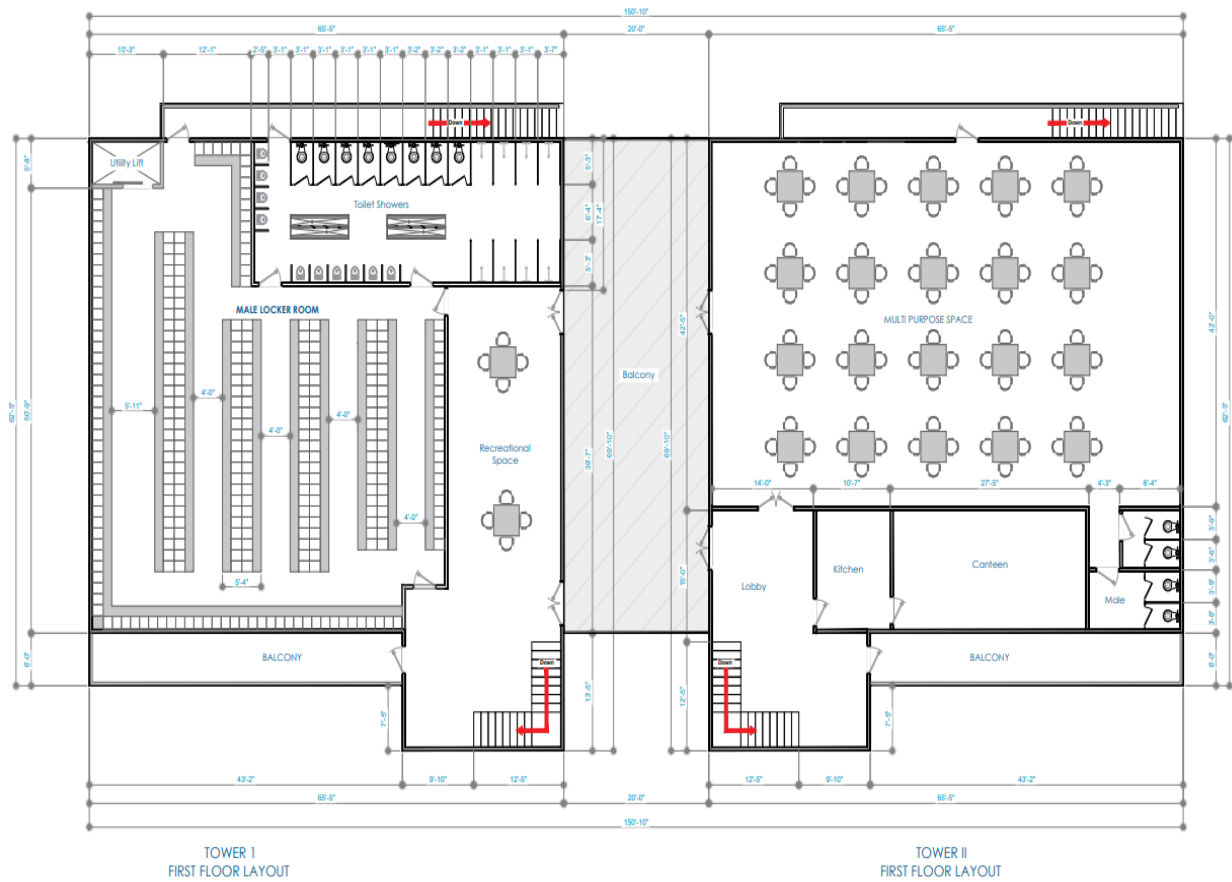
Proposed Tower 1 & 2 First Floor Layout
